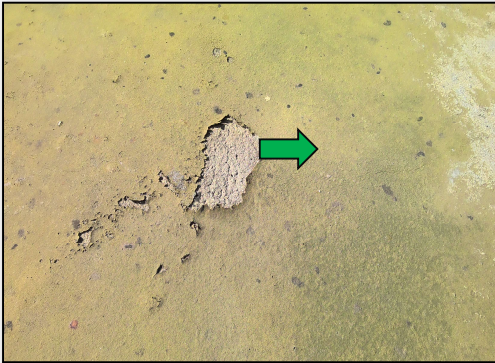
Level 32, internal, upper layer rooftop floor - non-asbestos bituminous membrane.
